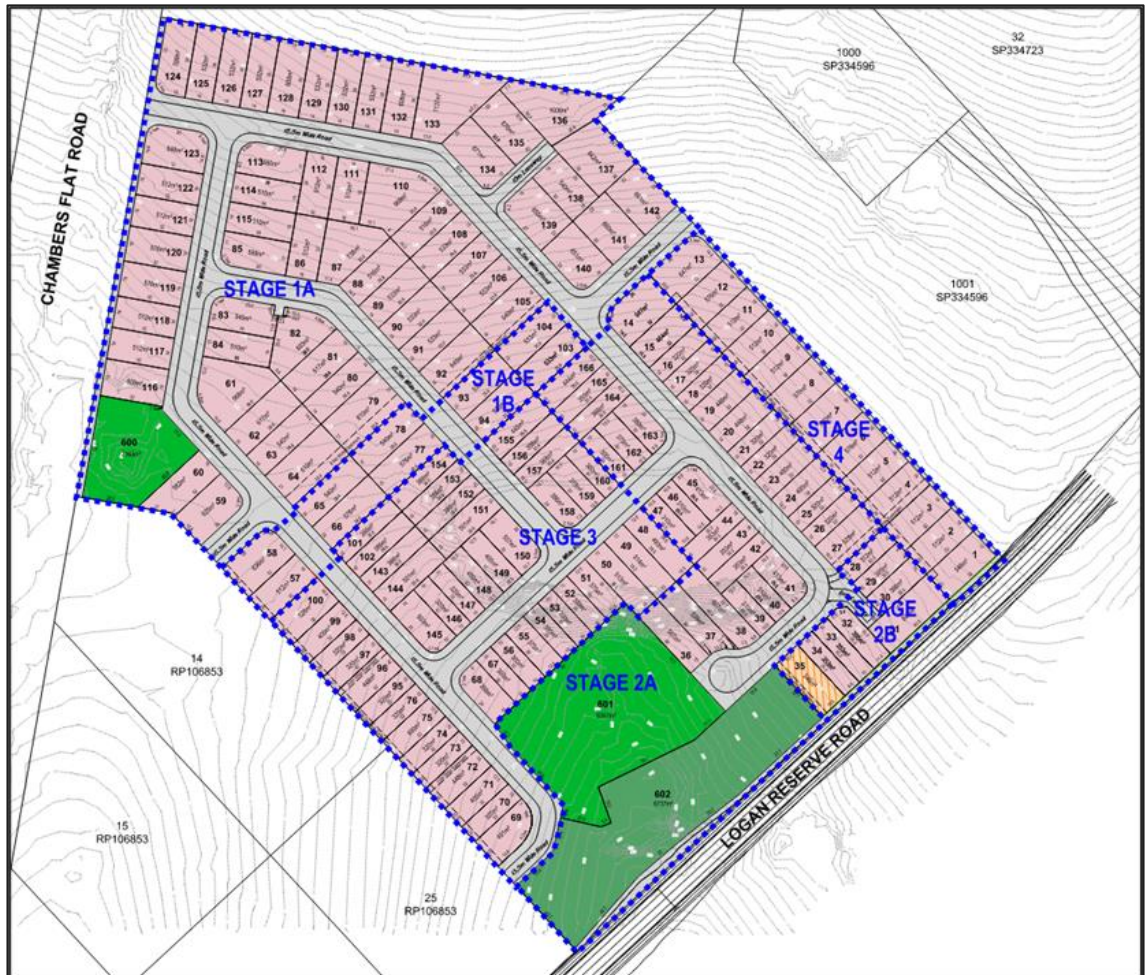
Development Proposal Plan (Courtesy of Wolter Consulting Group)
